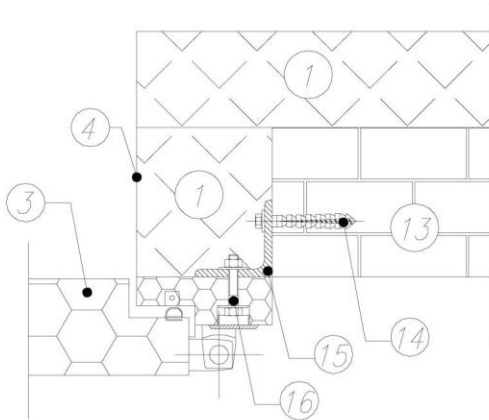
INSTALLATION OF FREEZER DOORS TO AN INSULATED FACILITY
